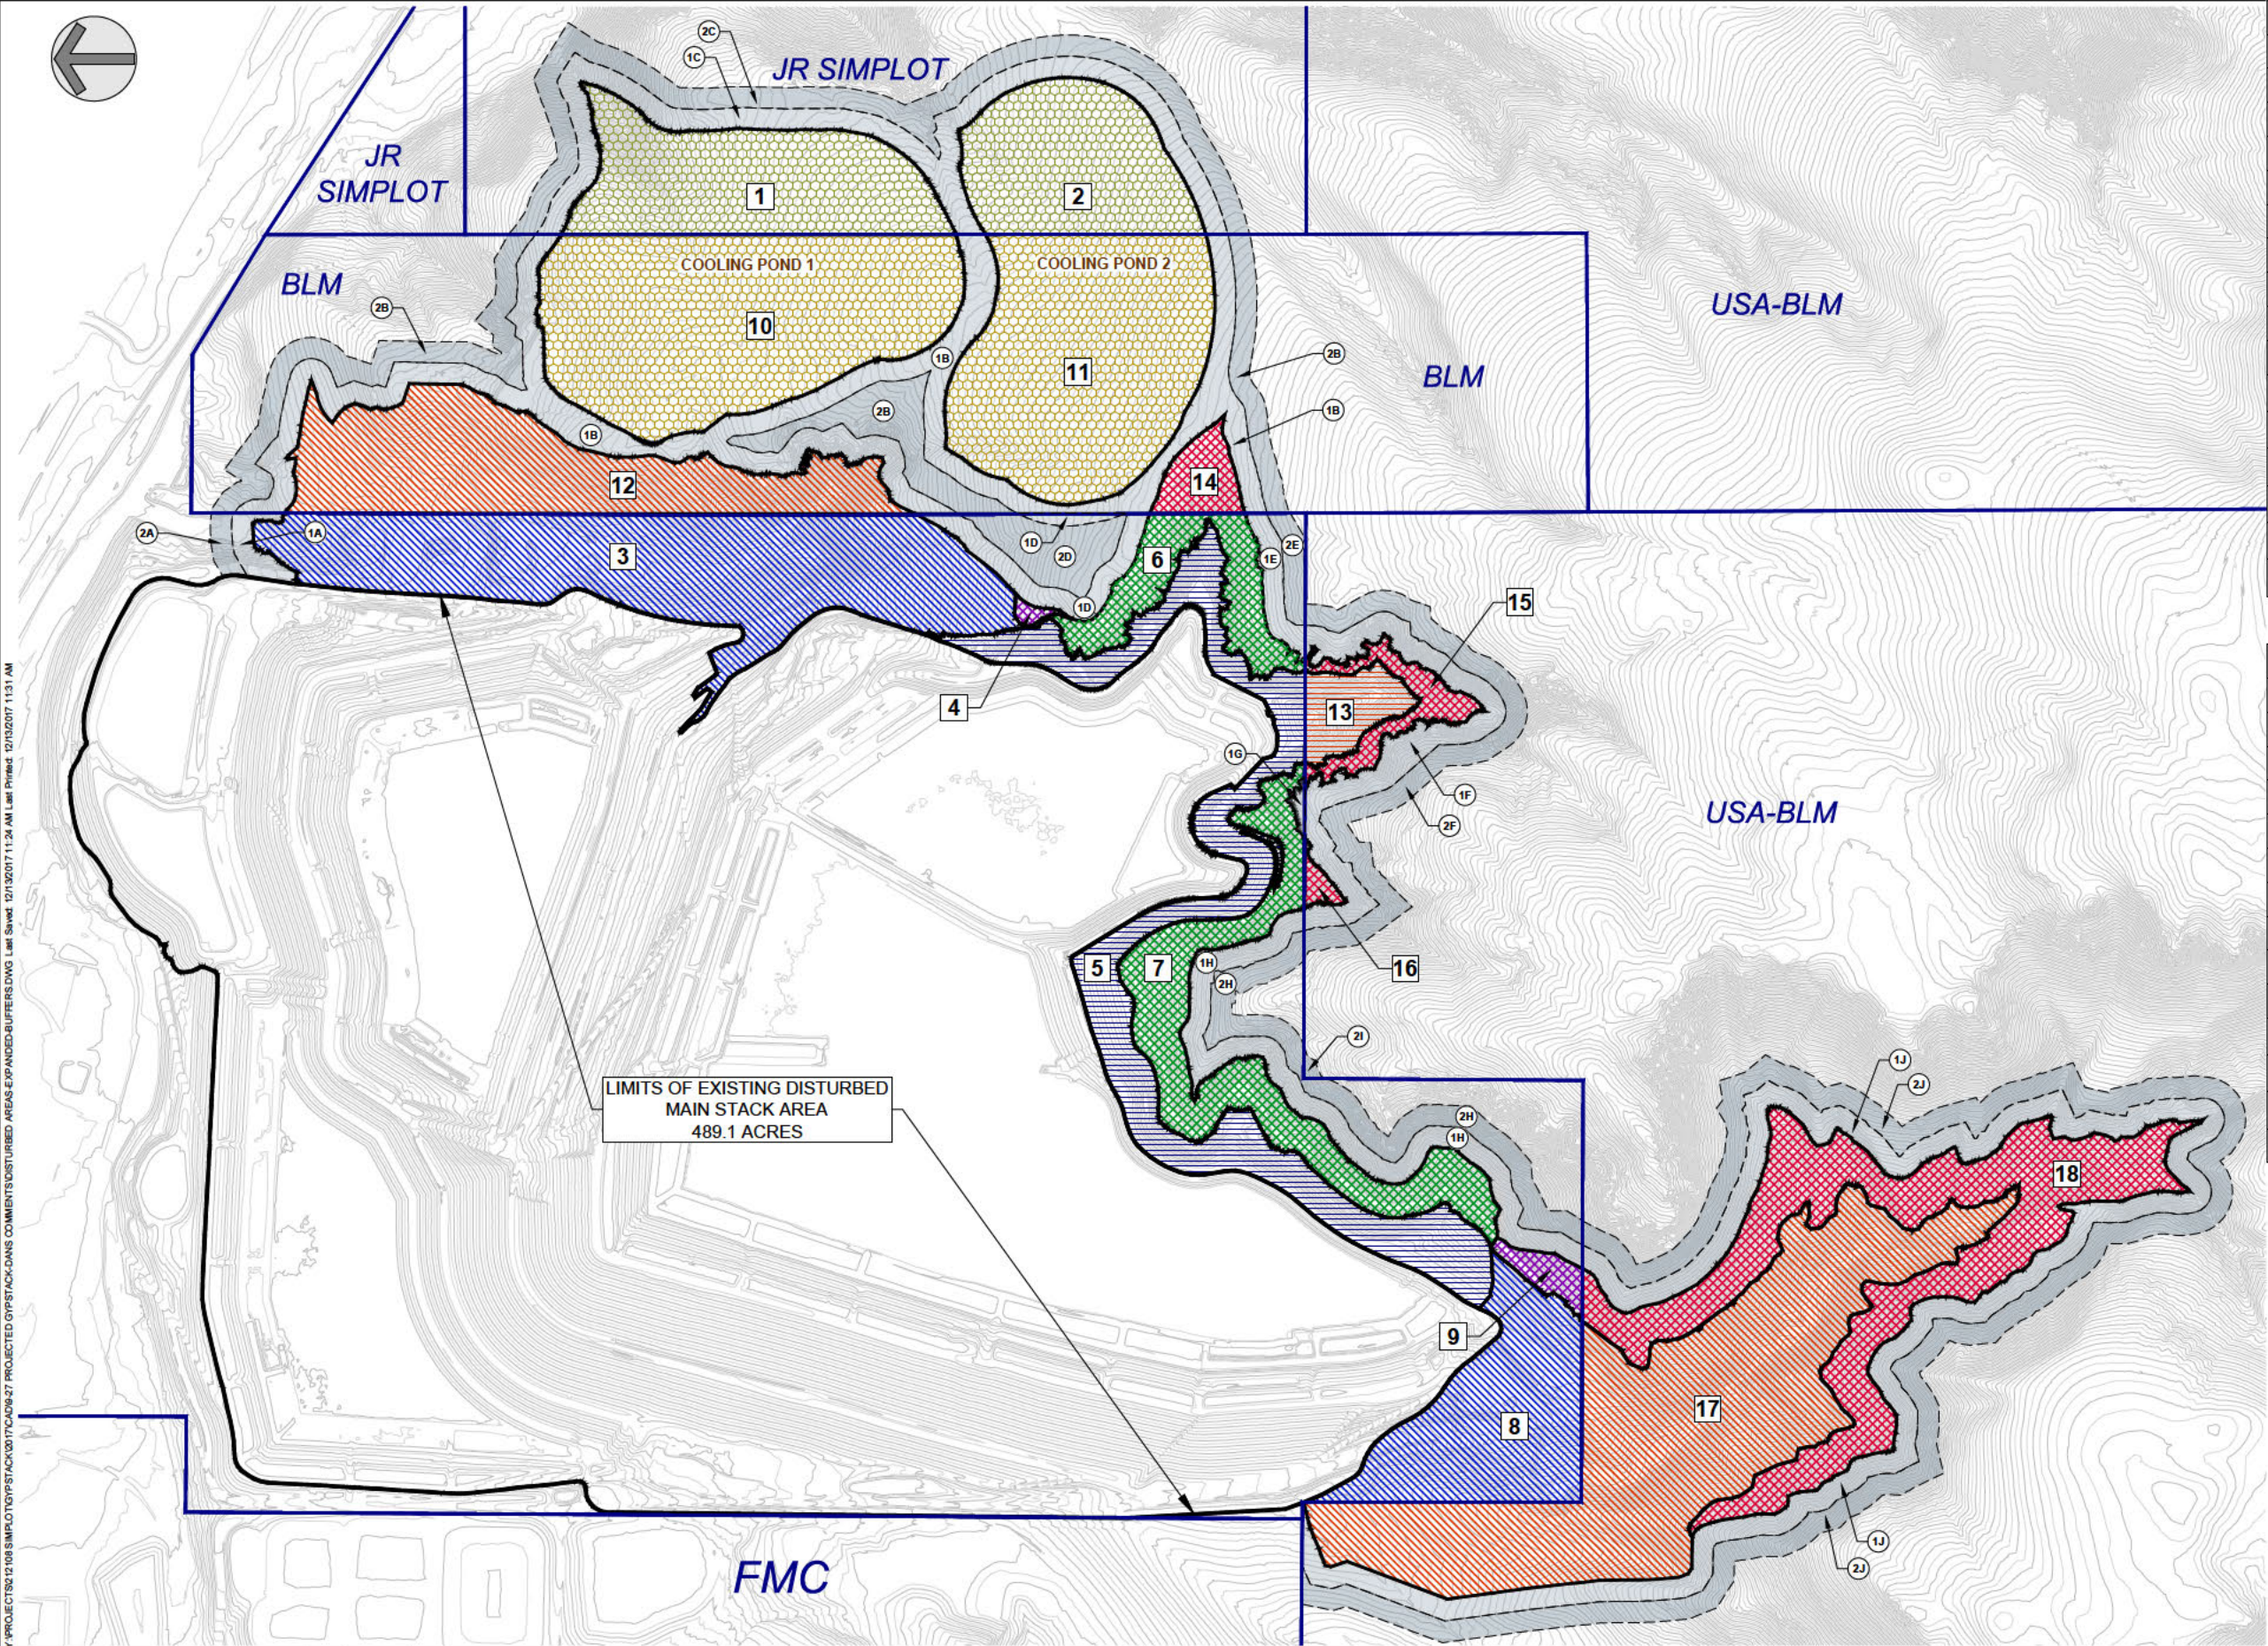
Proposed Actions for Cooling Ponds and Gypstack Expansion
